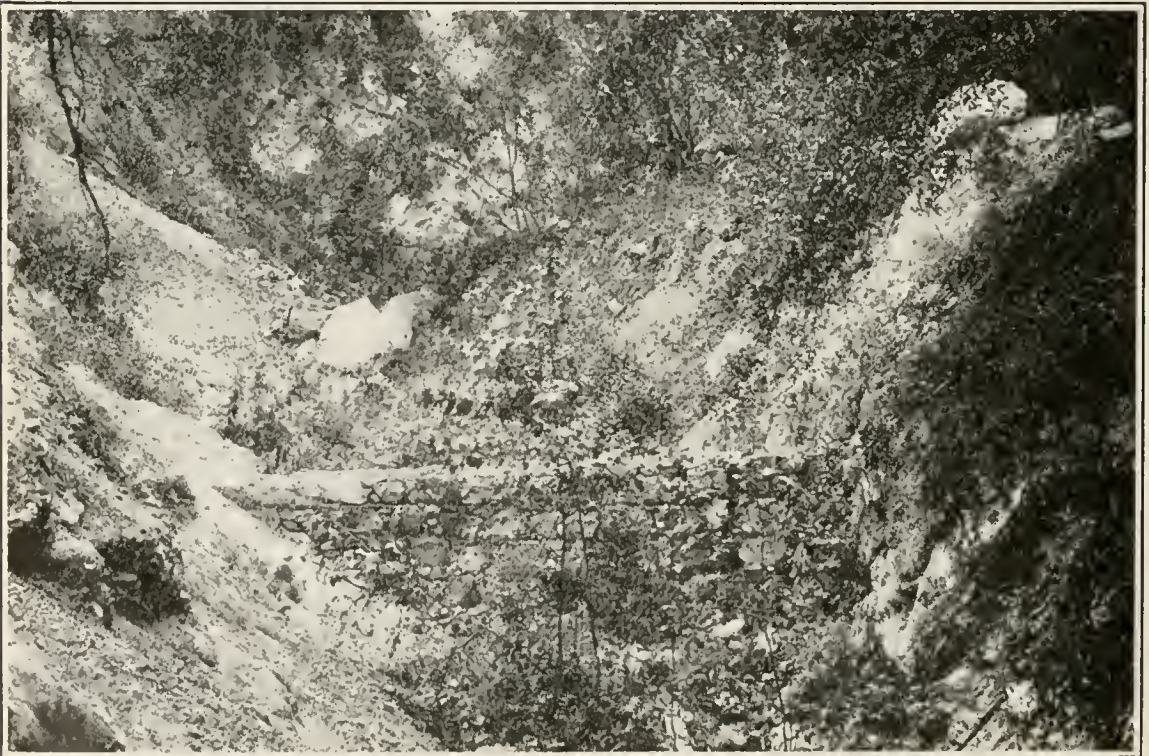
Check Dams in Pickens Canyon. First and second above footbridge near White place.
